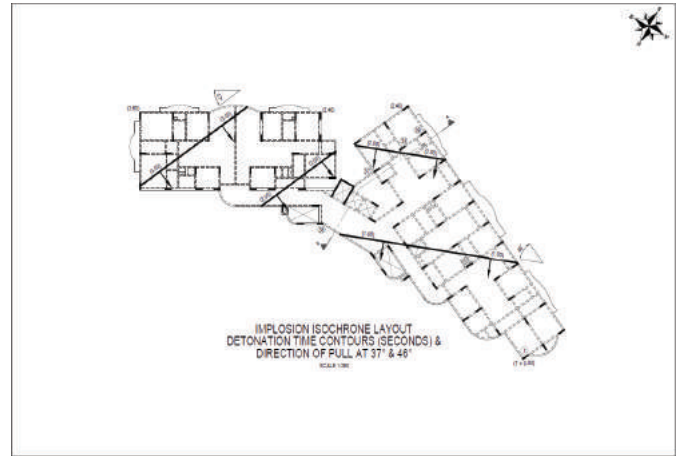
Implosion Isochrone Layout of H2O Holy Faith Apartment
